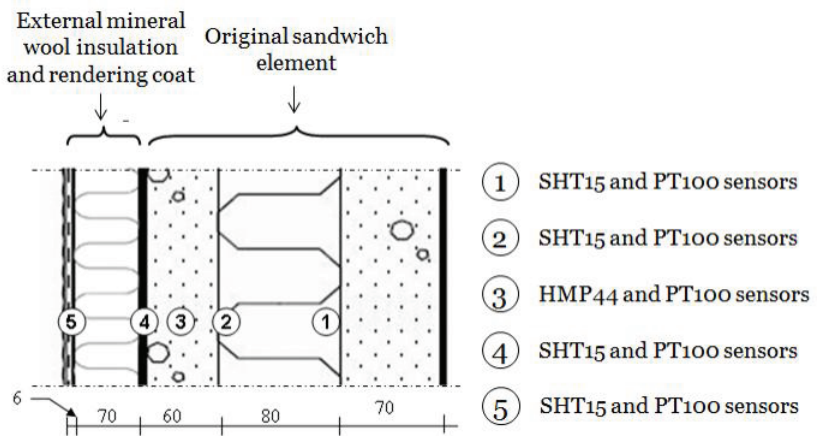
Wall cross-section and installation of nodes and sensors in the repaired facade (RF1-EPS)
